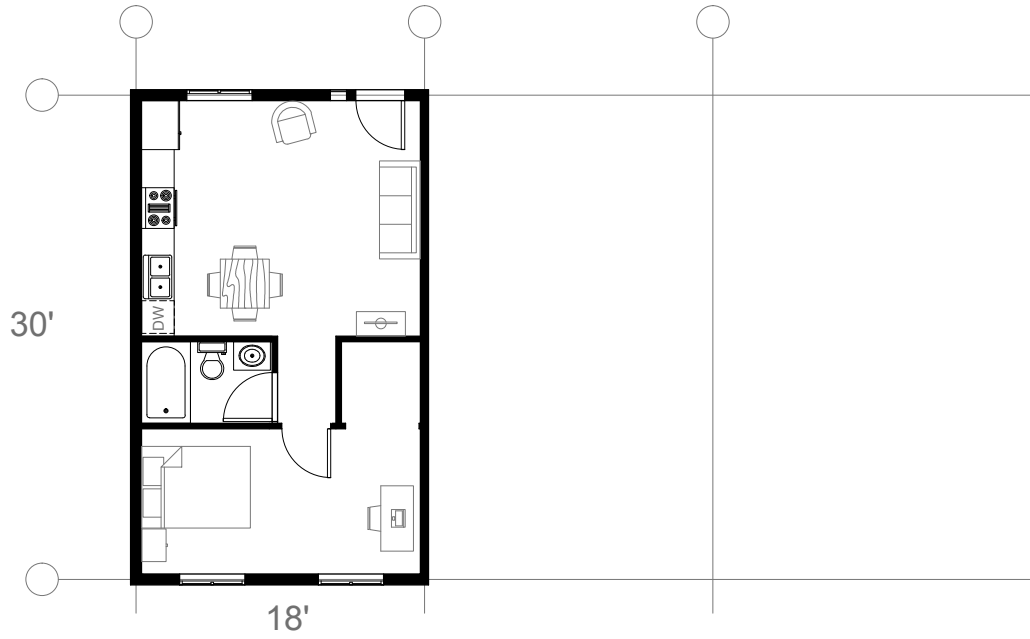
Floor plans, levels 2-6.5 of building on site A.
